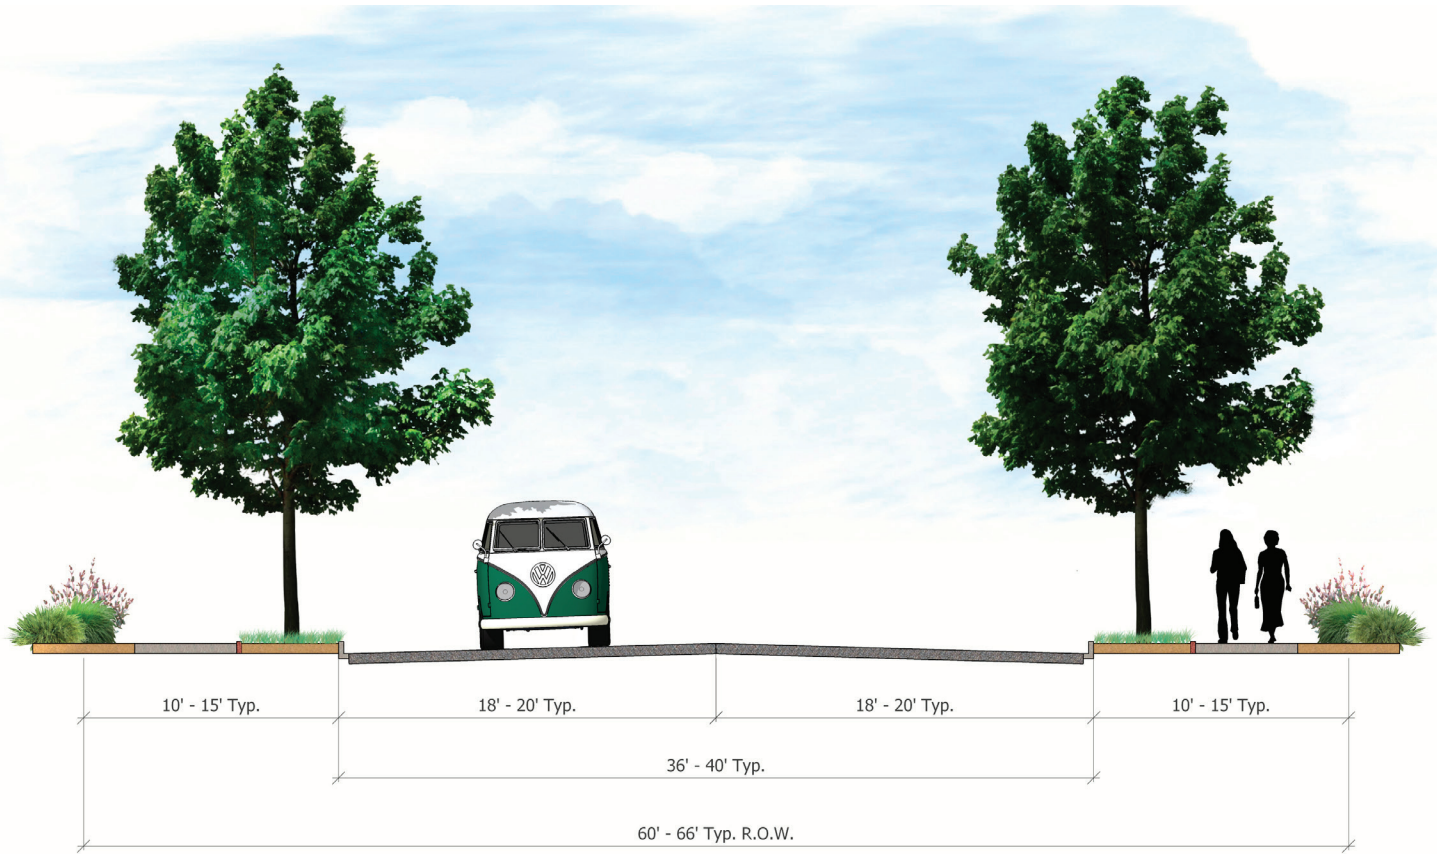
, Maple and Palm Avenues Landscape Concept
